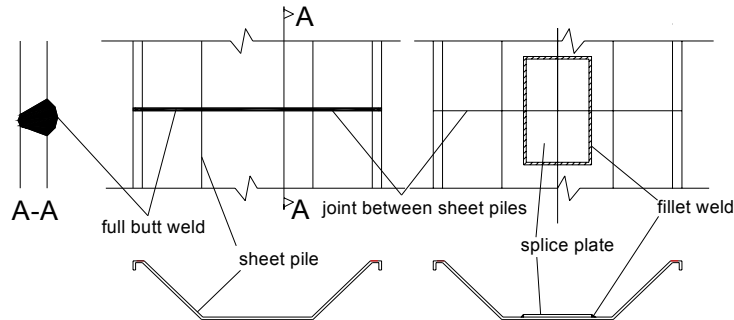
Full-butt weld sheet pile connection and fillet weld joint with splice plate.
